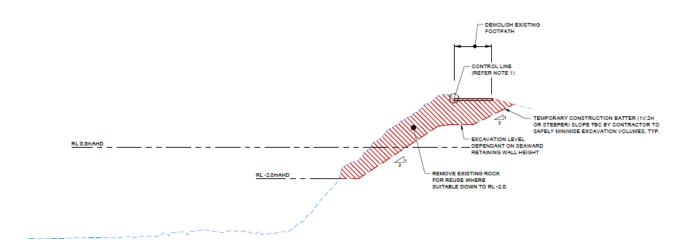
Step 1 – Demolition and Excavation (Source: Royal Haskoning DHV)
